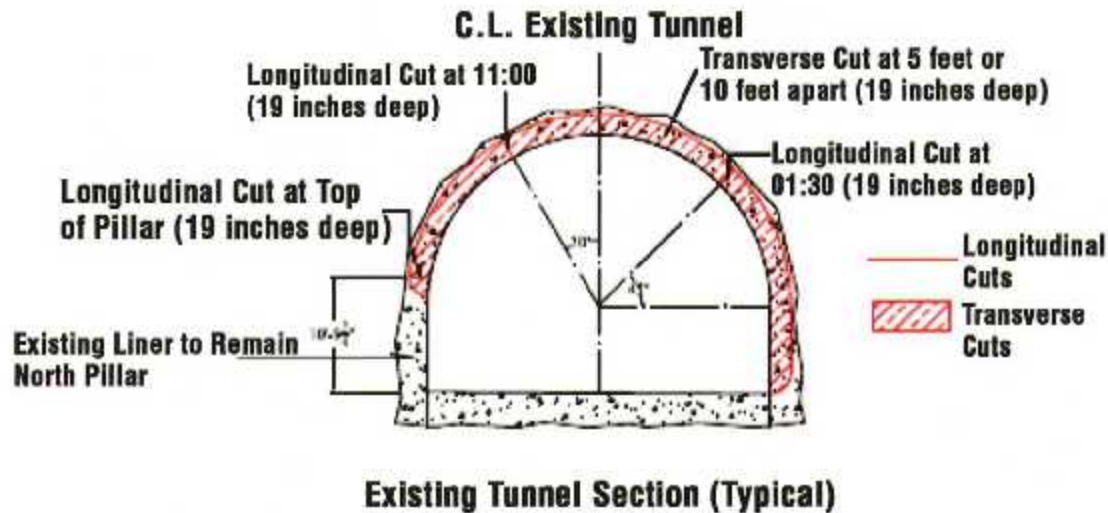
East Bound (2013) saw cut plan (tunnel section).
